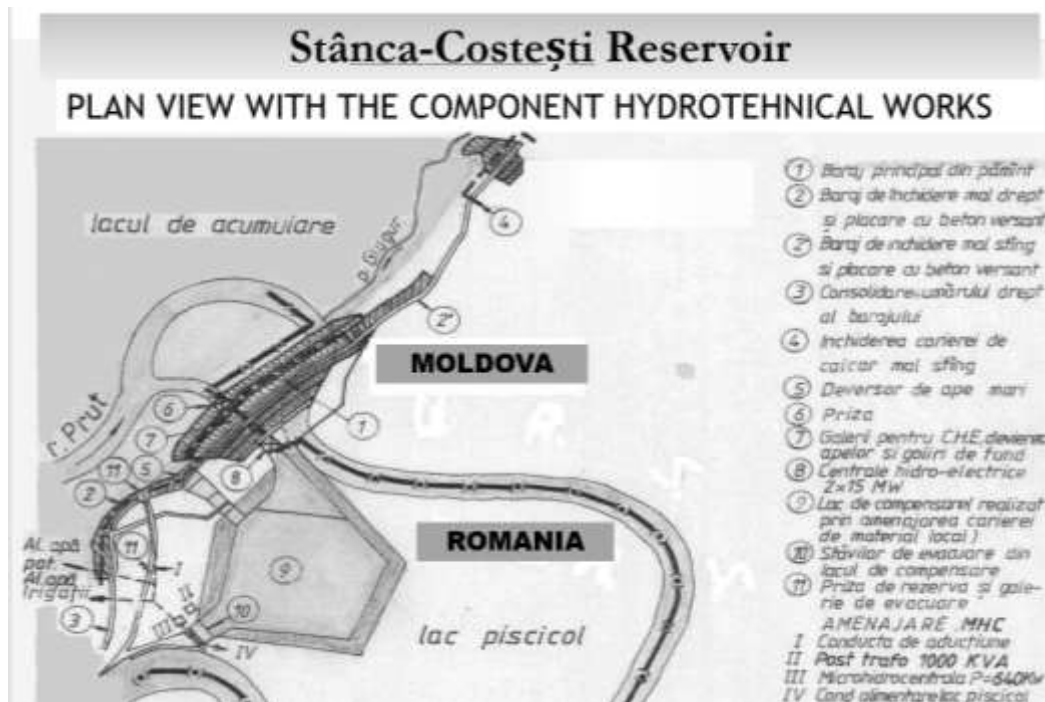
Plan view with Stanca-Costesti dam and the hydrotechnical works
